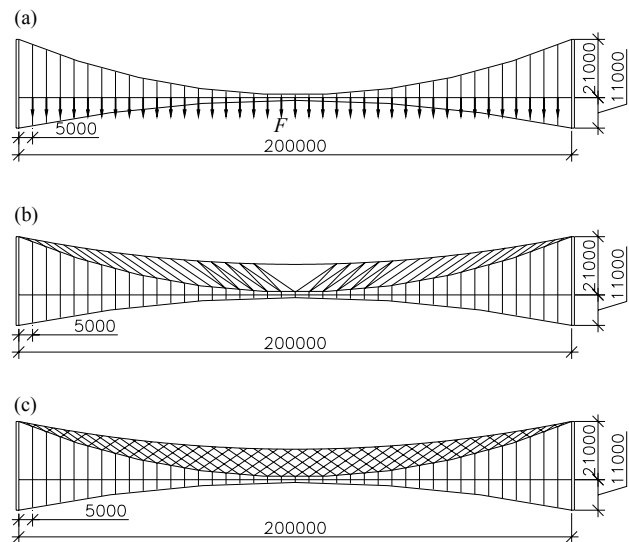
Types of constructions. (a) – Single cable, (b) – Cable truss with inclined elements of the web, (c) – Cable truss with the cross web
